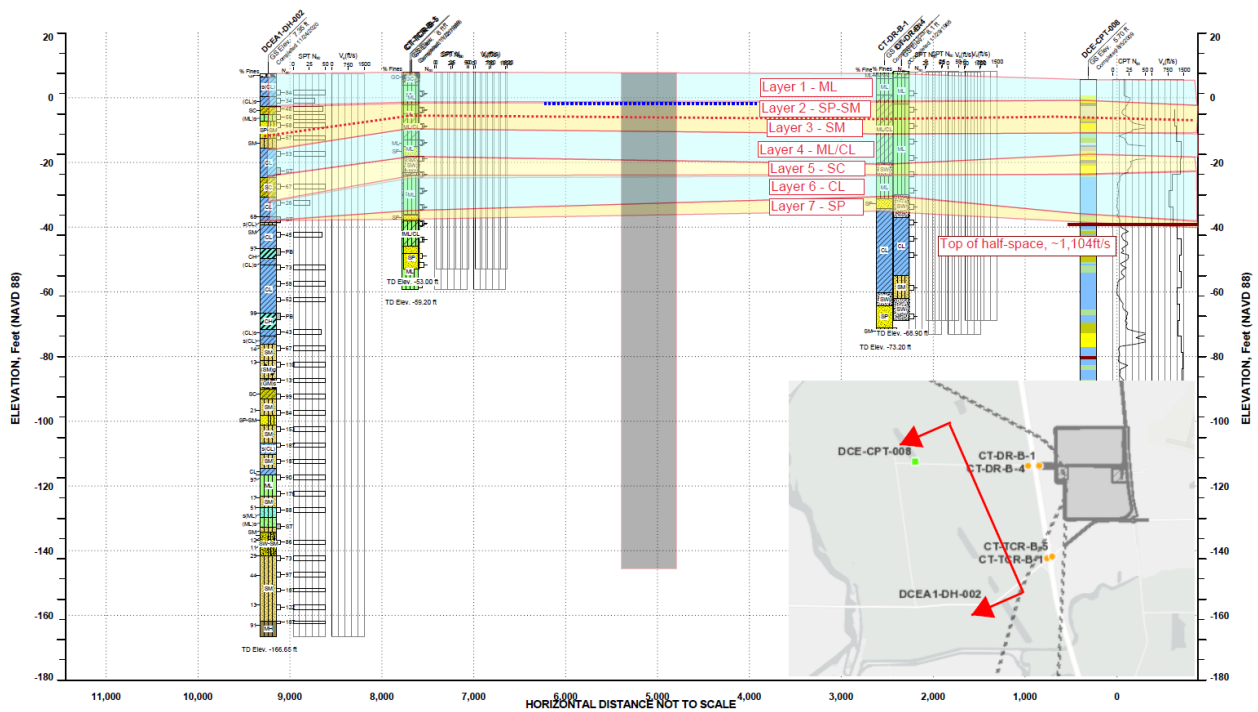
Idealized Soil Profile at Twin Cities Road Facility Site
